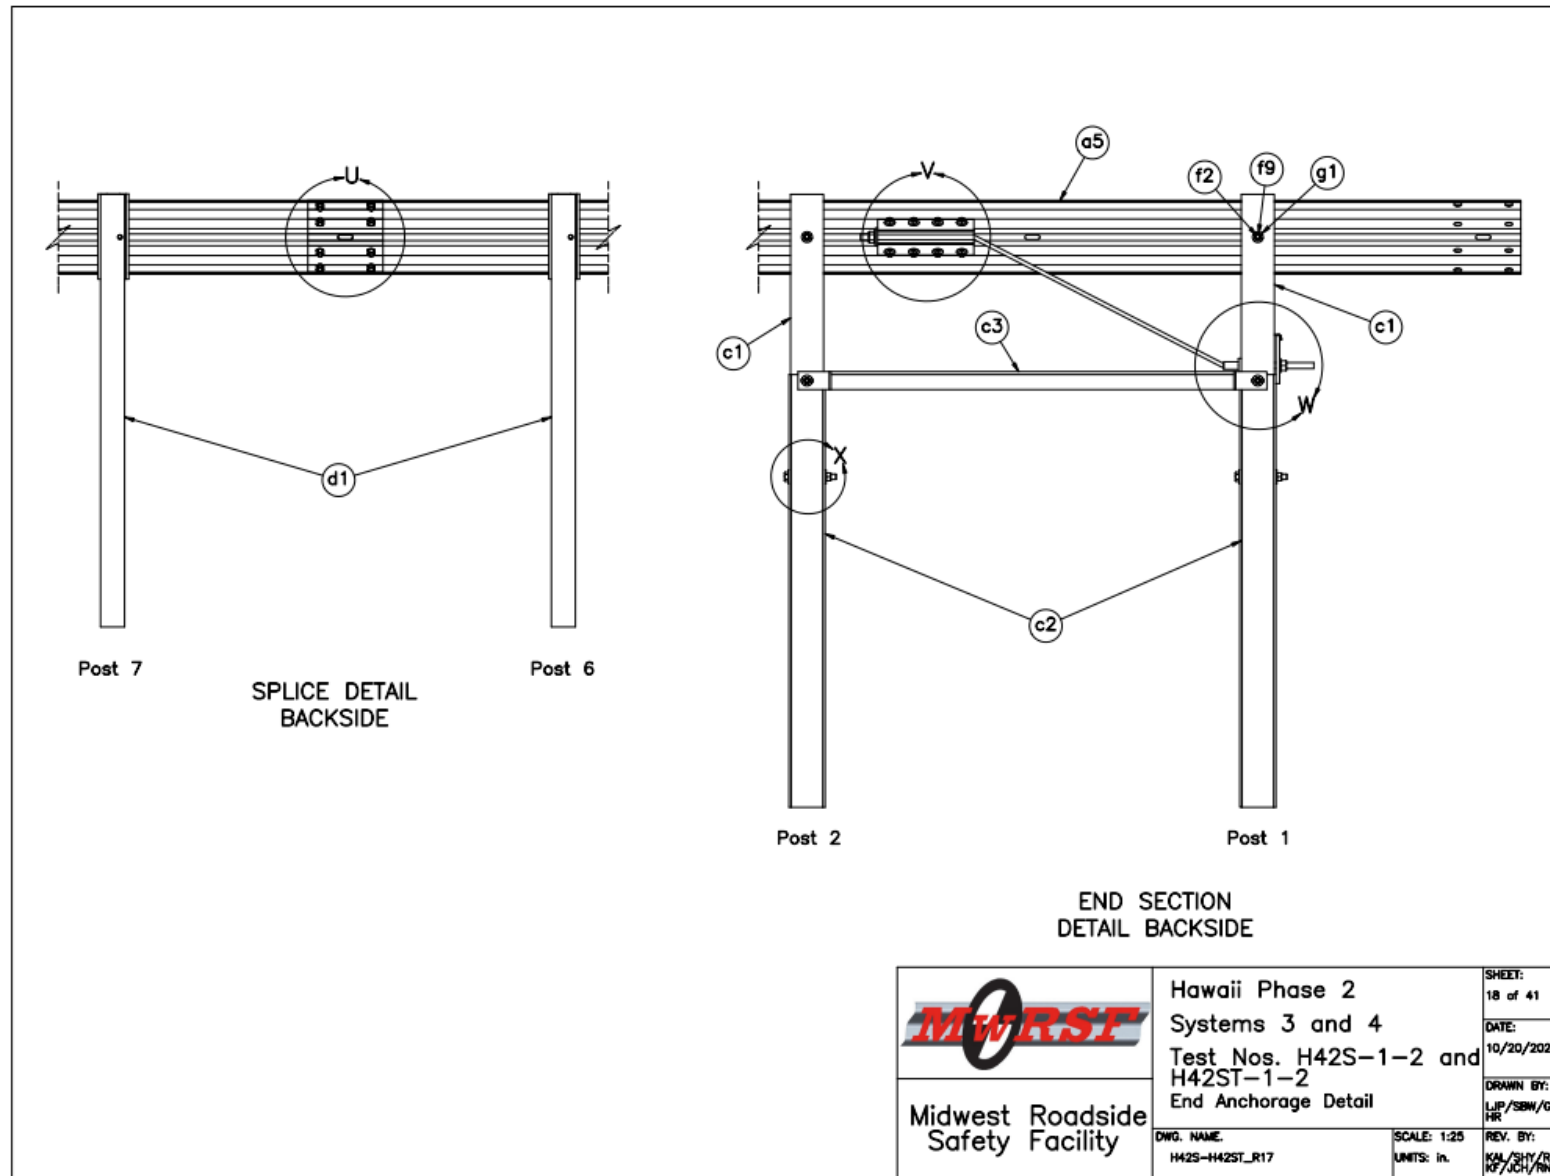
End Anchorage Detail, Test Nos. H42ST-1 and H42ST-2
